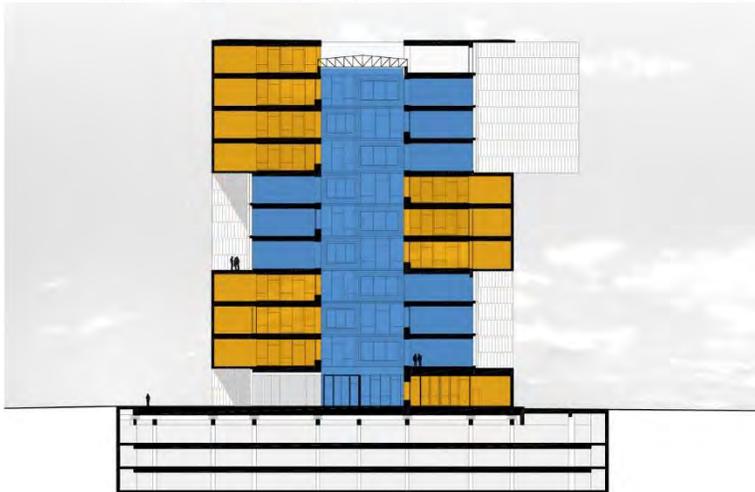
Ground Floor Plan & Section (ELEMENTAL, 2014 September 22)
